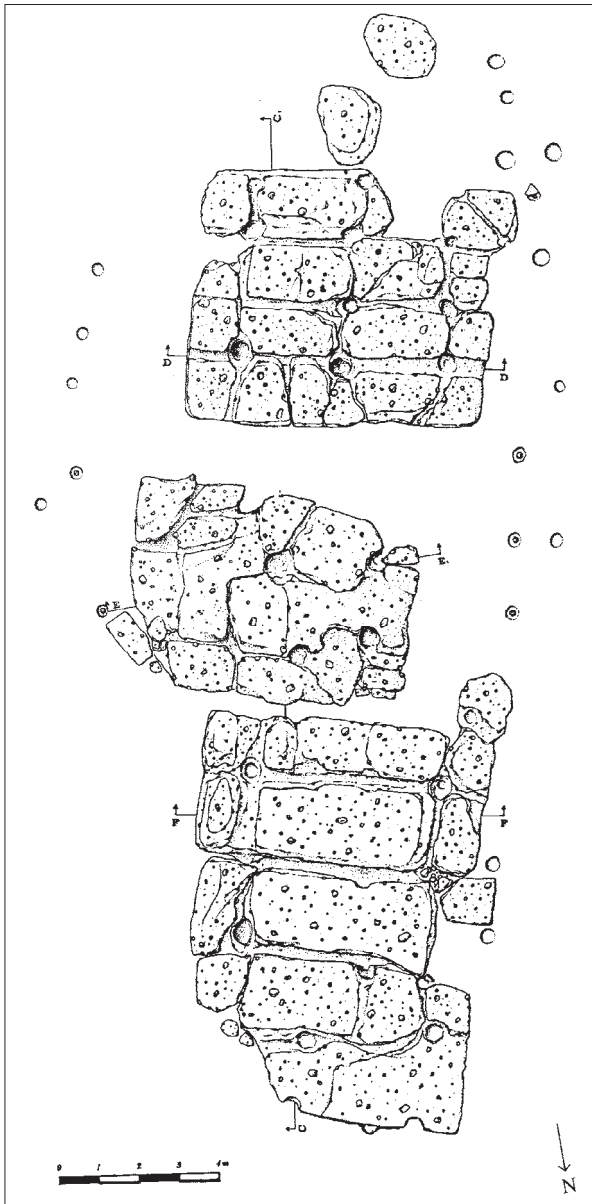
Plan of the southeast mole at Egnazia (Auriemma 2004: 48, fig. 29; used with permission).
